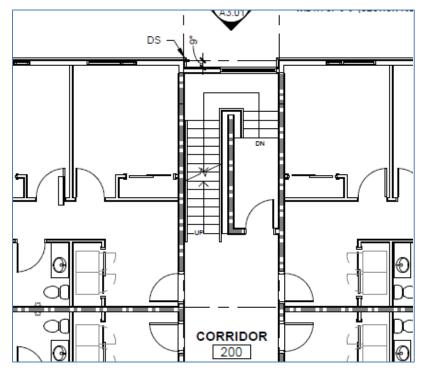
Internal stairway detail from 2nd floor plan of Building I
